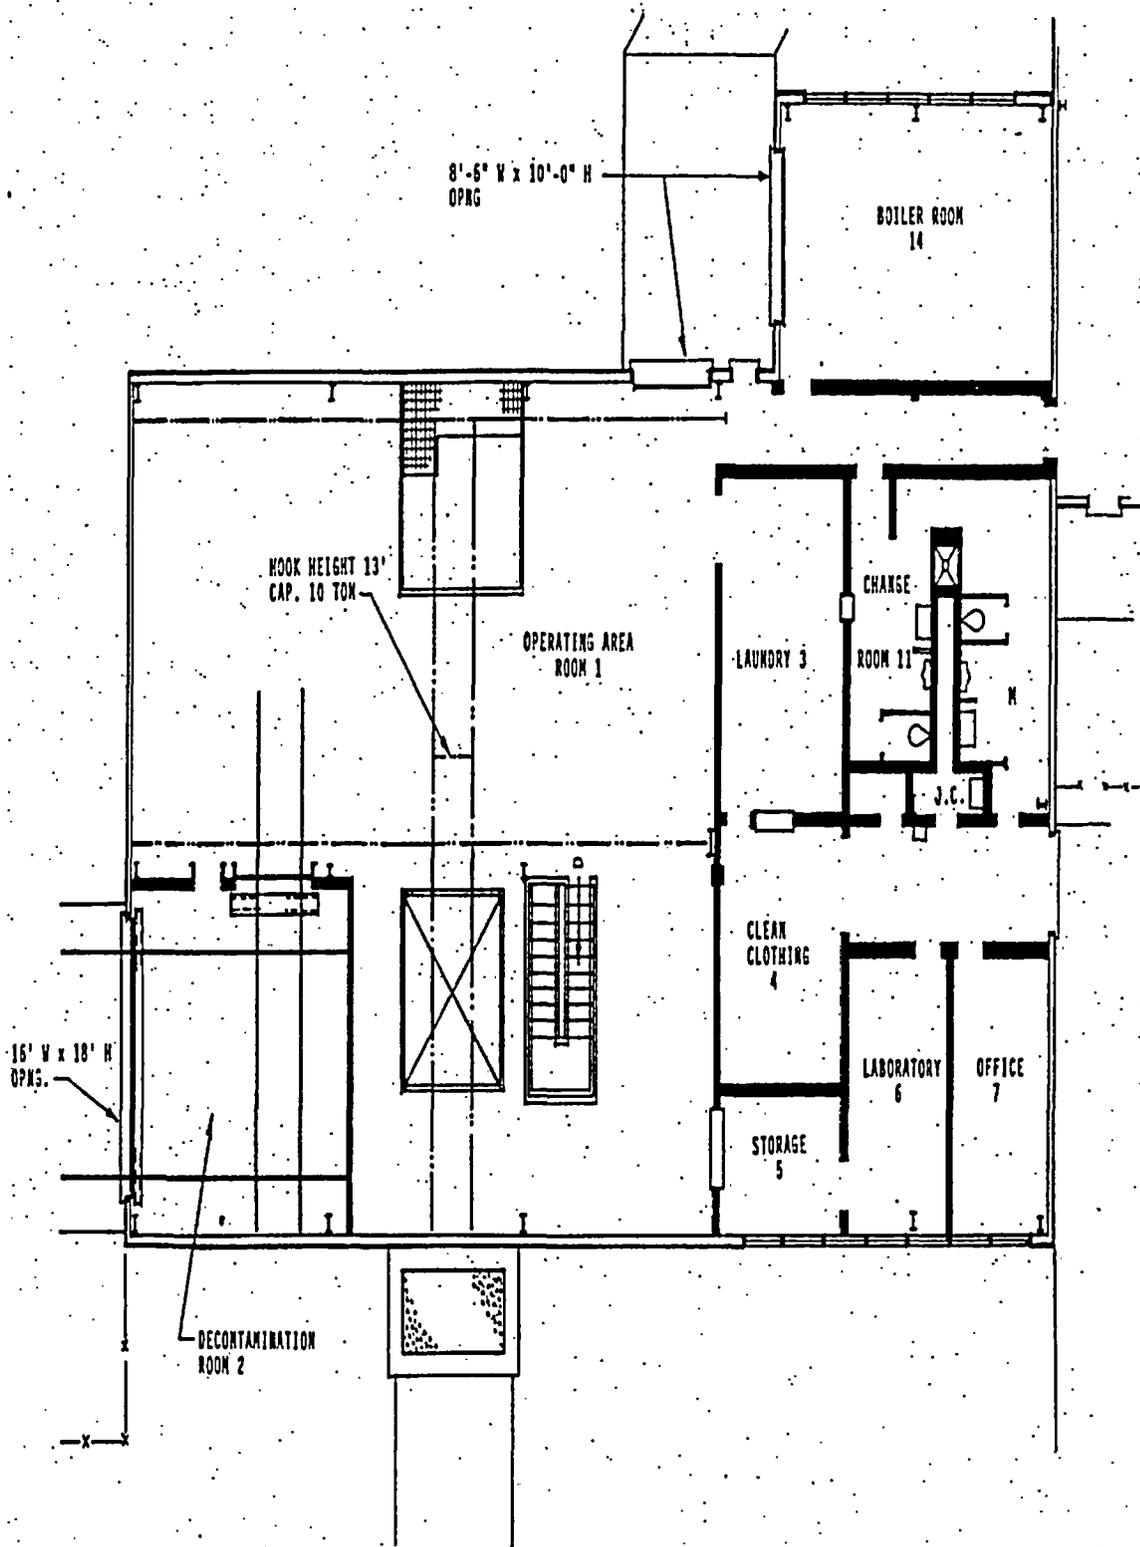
Plan View of Waste Handling Building (1133) (modified from NASA 1980b)
